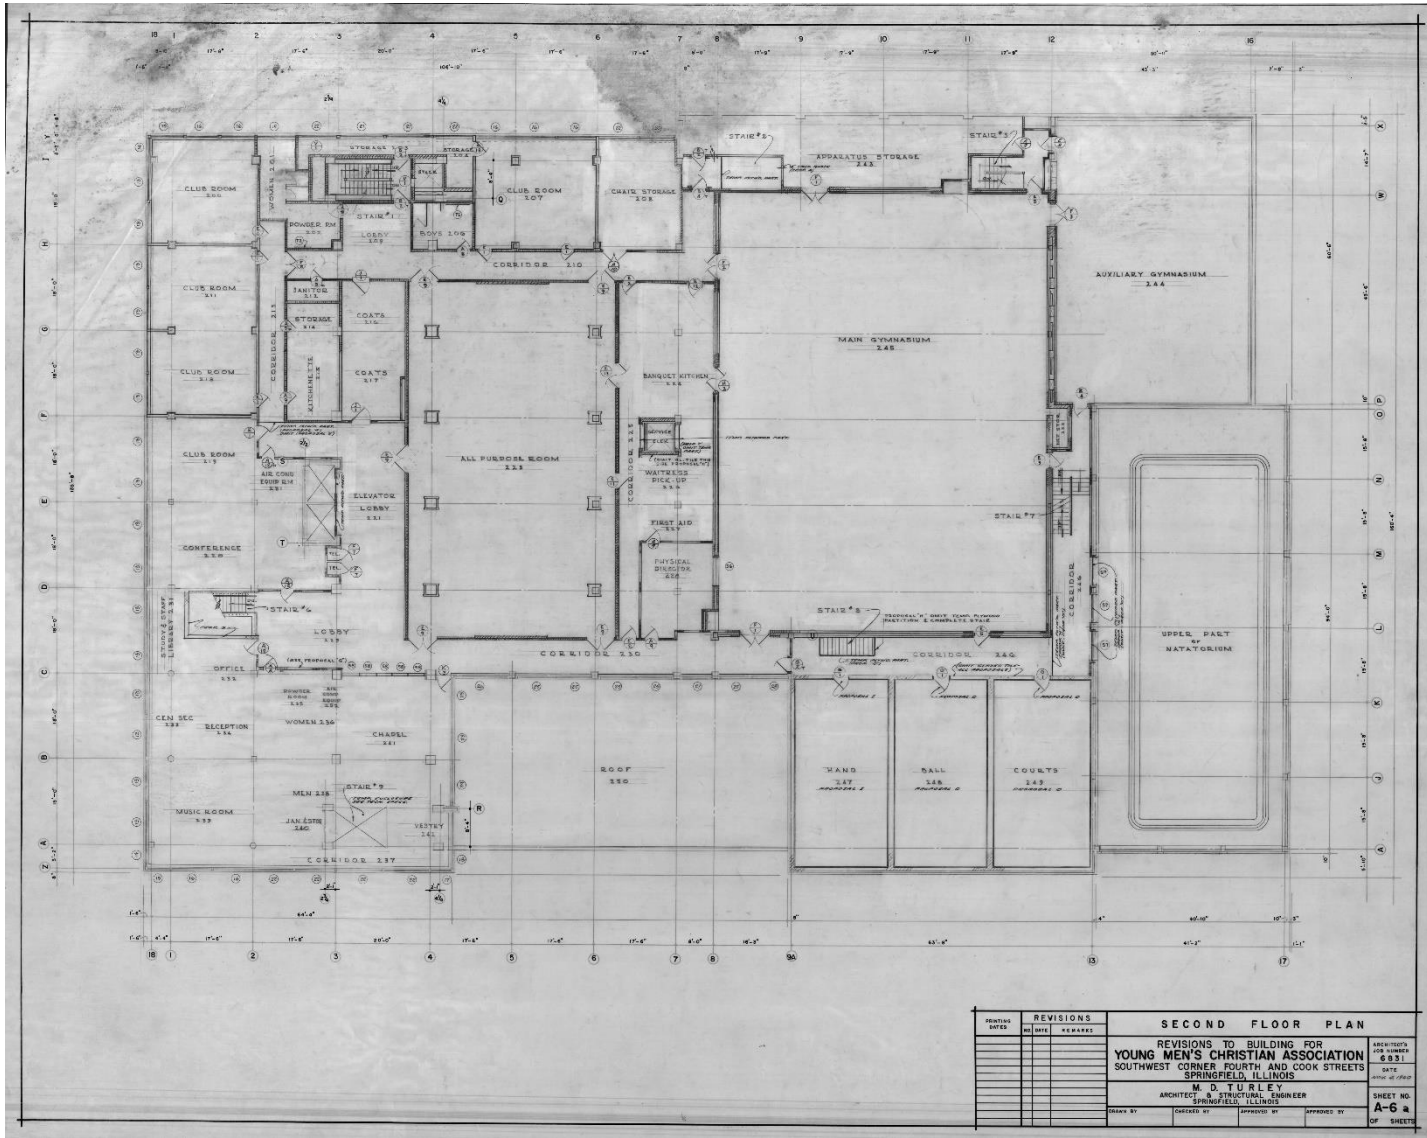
Second Floor Plan, Revisions to Building for Young Men's Christian Association (Turley 1960: Sheet No. A-6a) [November 4, 1960].
